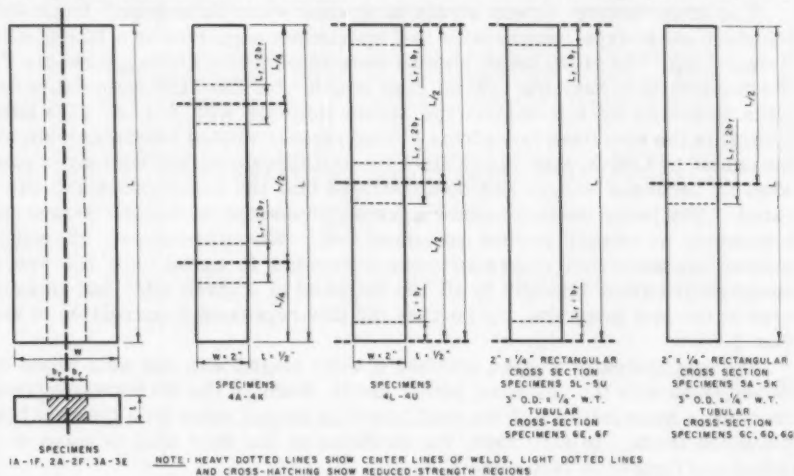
DETAILS OF WELDED COLUMN SPECIMENS
